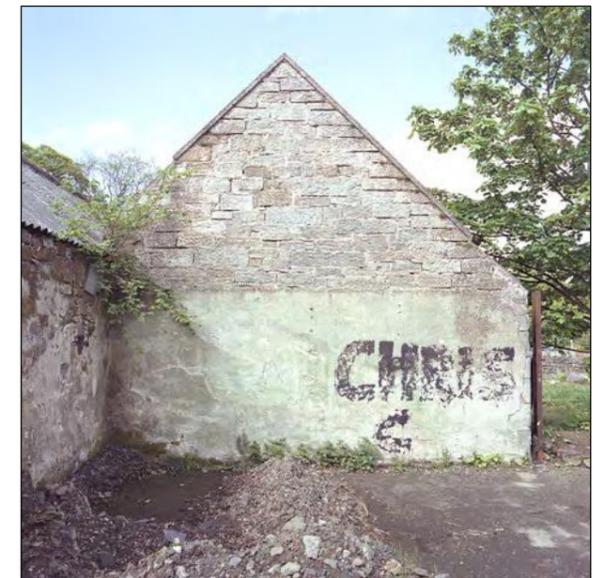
Range E, East facing gable end with Range D to left of picture.
